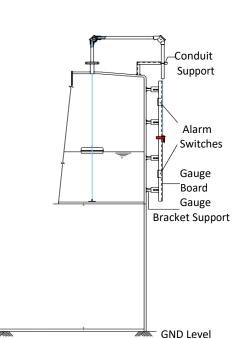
Gauge Board with Full Travel mounted on Side of Elevated Tank
